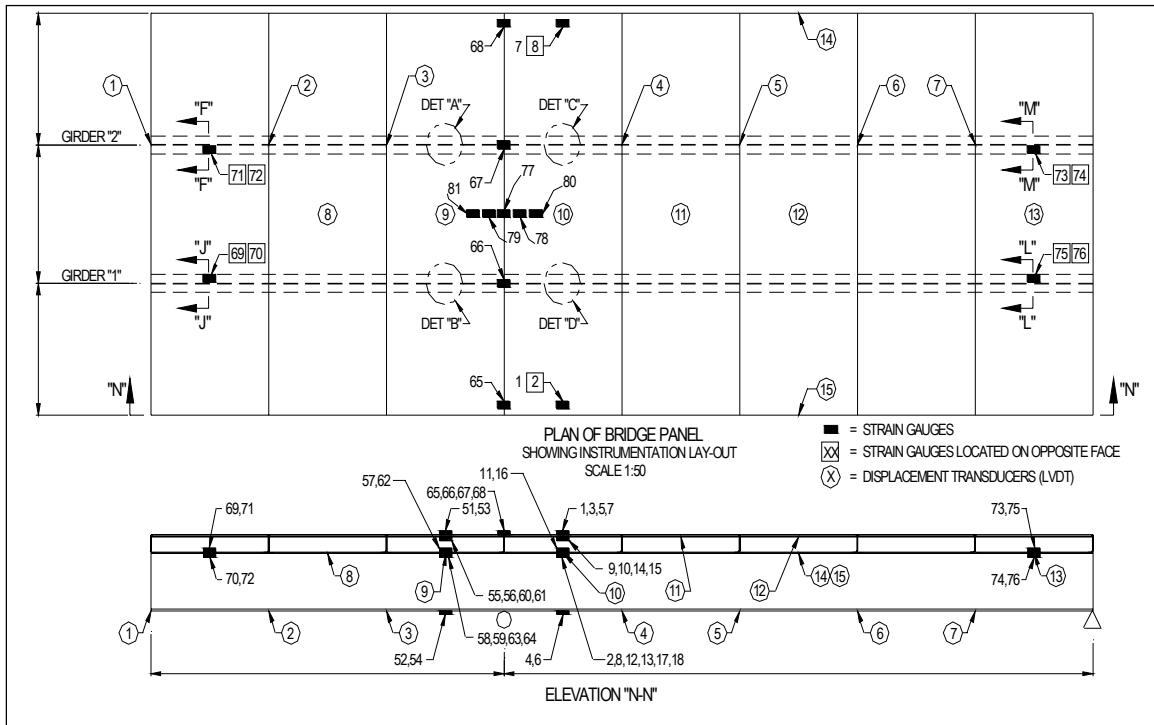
INSTRUMENTATION LAYOUT FOR LOAD CASE C4
